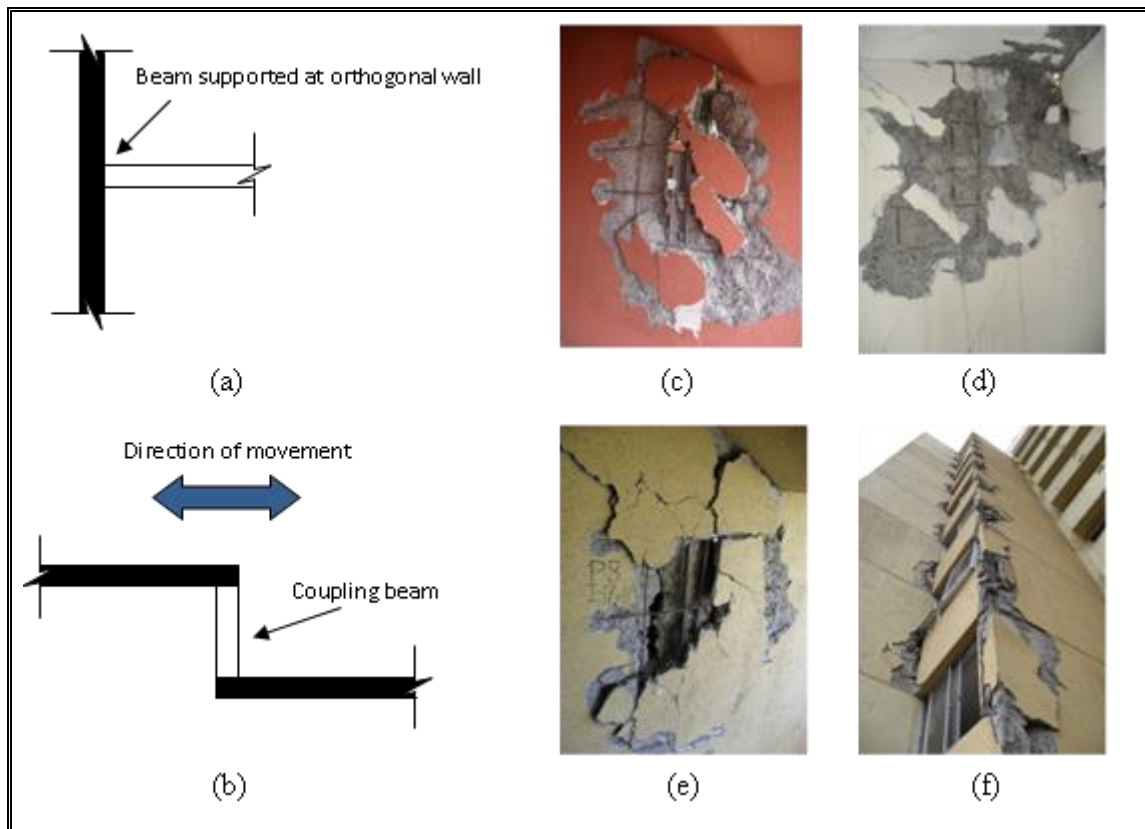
(a) Beams supported at orthogonal walls and (b) beams coupled with transverse shear walls. Beam punching at (c) RT-8, (d) TO-9, (e) PP-7. (f) Damage in coupling beams of PP-7
